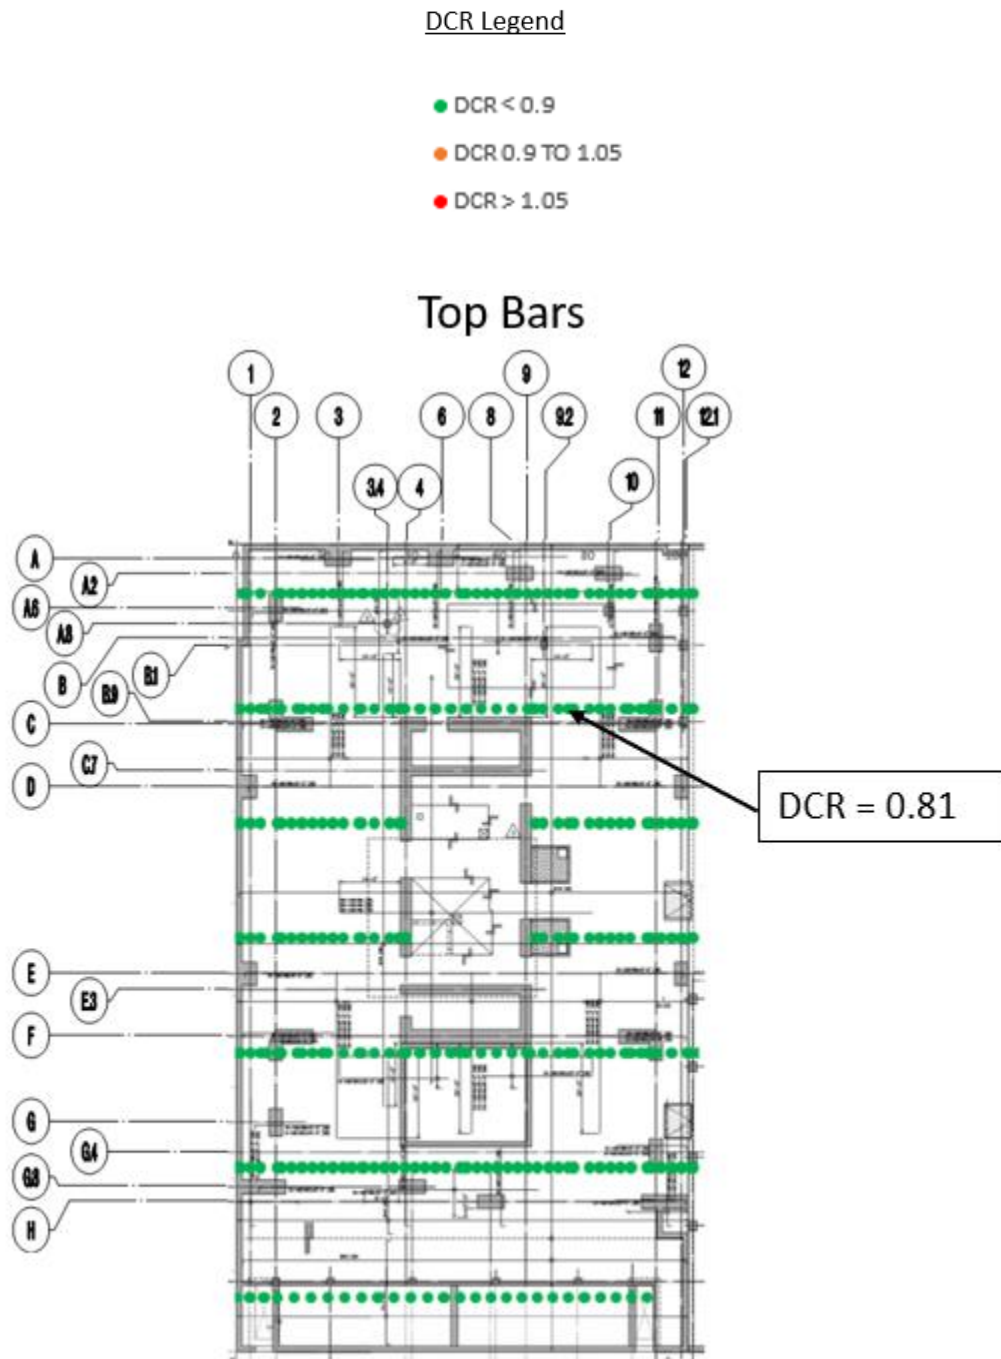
DCR Plot for East-West Top Reinforcement Design Strips for Gravity Load Envelope Existing Condition
